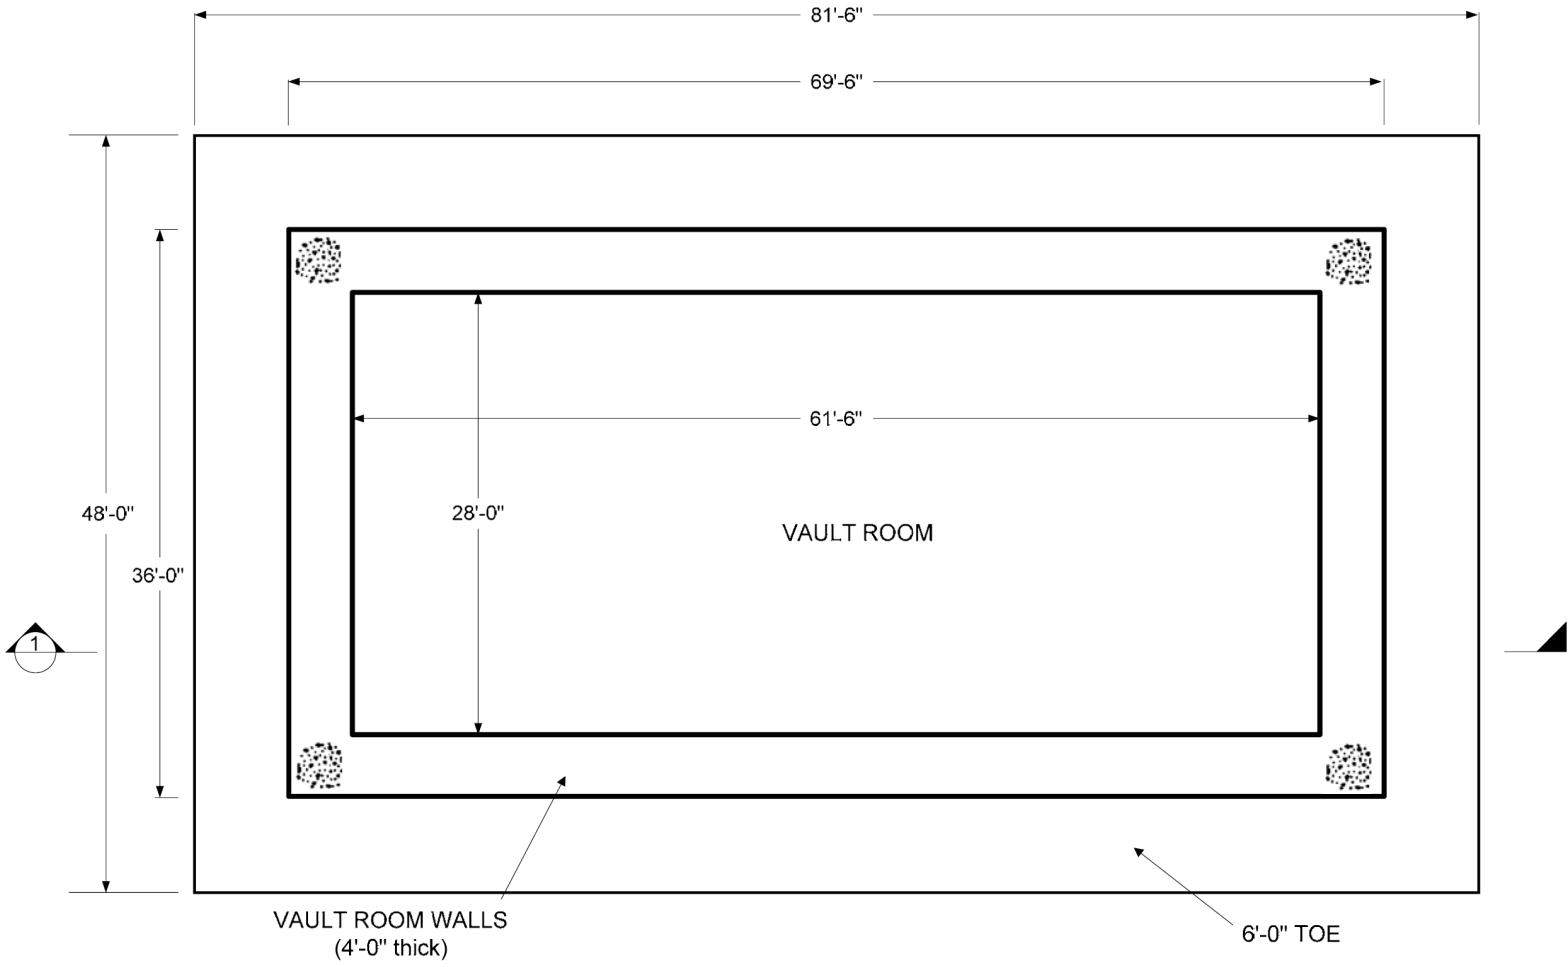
H.6-250 Plan View of DGFOV at Elevation -3'-0"
